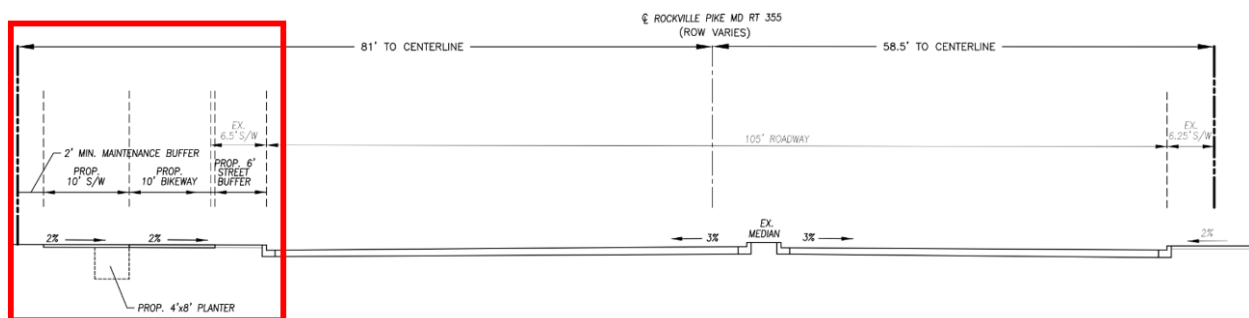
Rockville Pike Cross-Section, Looking north with Subject Property Frontage in Red
